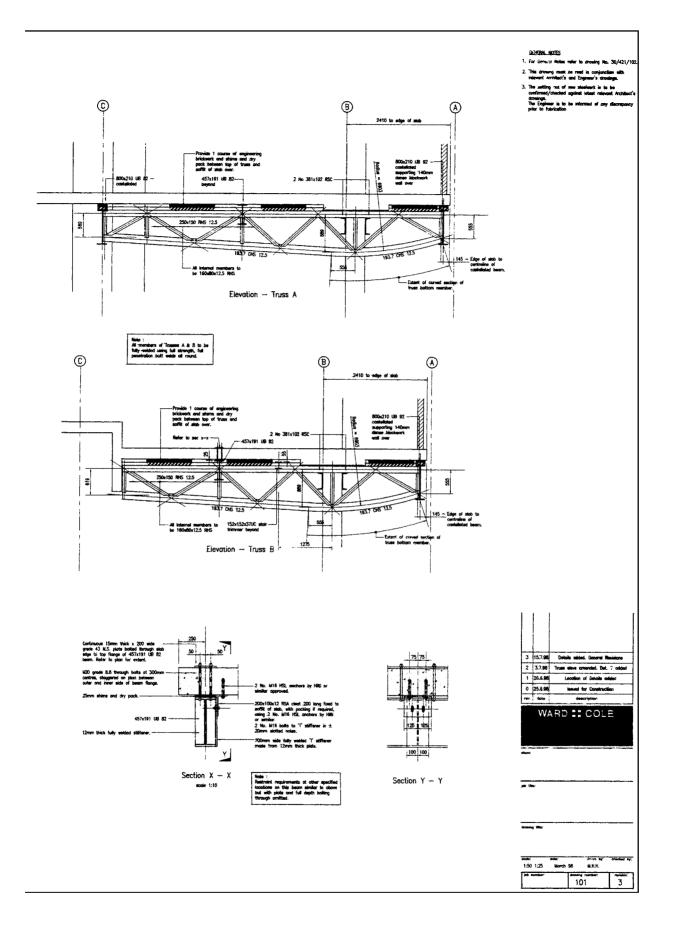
Steel truss roof and supporting ancillary structures
